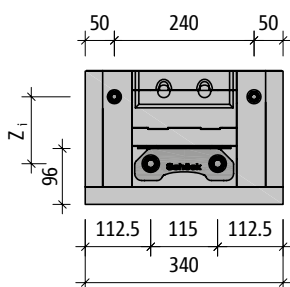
Side elevation from outside: Schöck Isokorb® type RKS10
